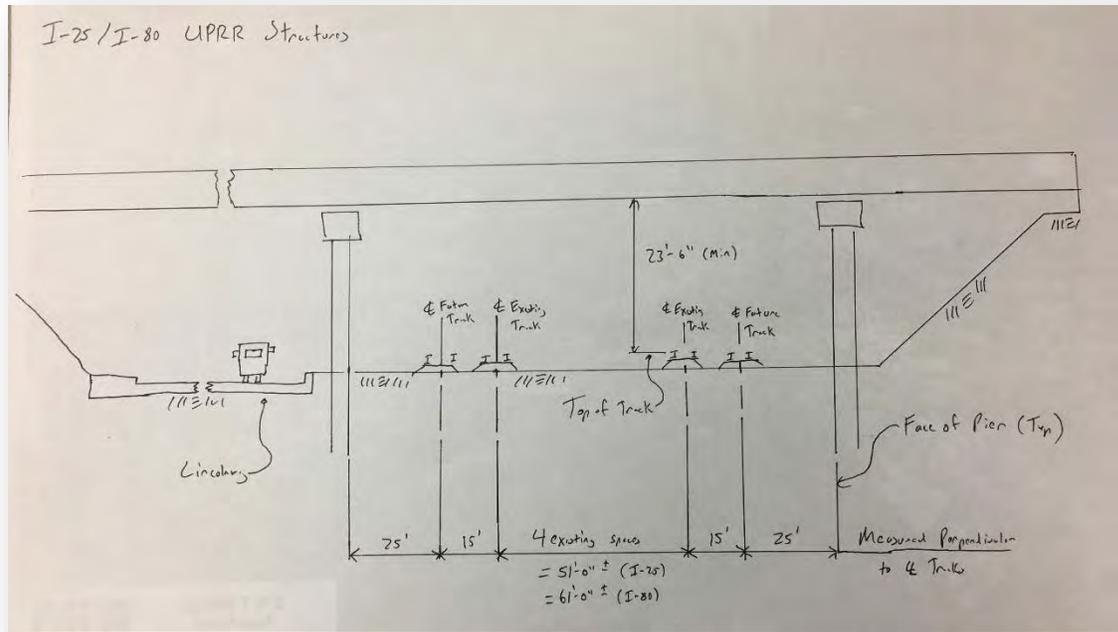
Clear Span I-80 and Proposed Three-Span Bridges over UPRR
